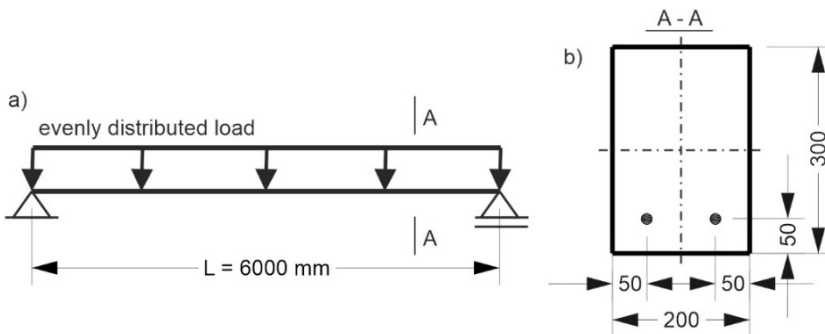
Analysed beam: a) static diagram, b) cross-section shape
